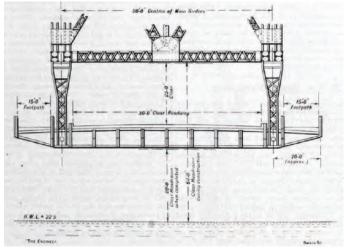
Cross-Section of Proposed New Howrah Bridge
